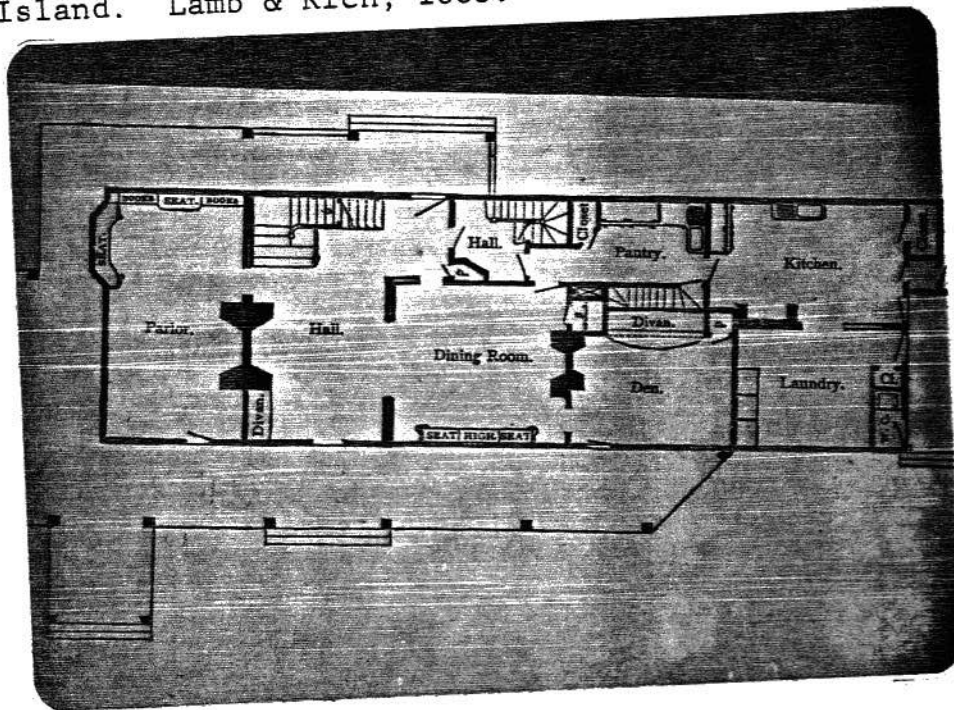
"Sunset Hall". Lamb & Rich, 1883, plan.
